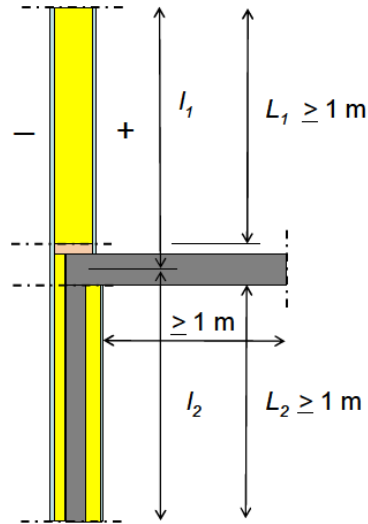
Example of walls and floor joint with thermal bridge. (Heikkinen et. al. 2012, 8)
